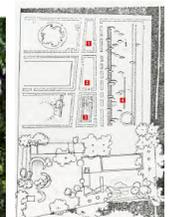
Garden plan, Anderson (Raxworthy 2011)
